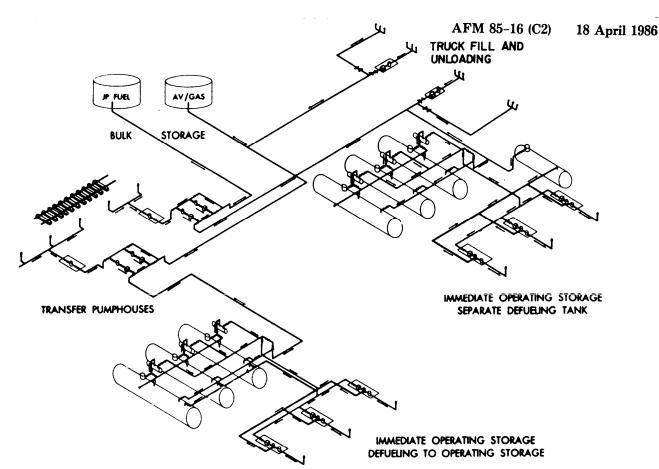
Assembled Components of Petroleum Storage and Dispensing System I (Panero).
